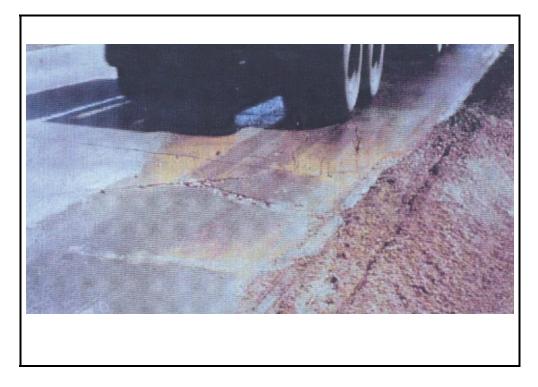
Pumping in Jointed Concrete Pavement, High Severity
